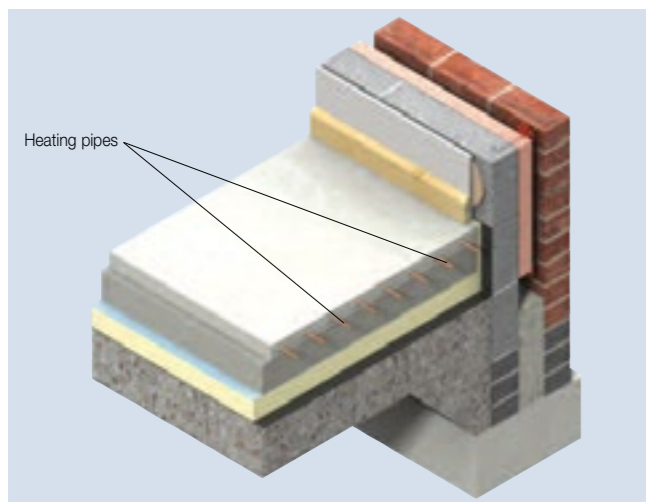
24 Hour Heating Applications – Below the Floor Slab
